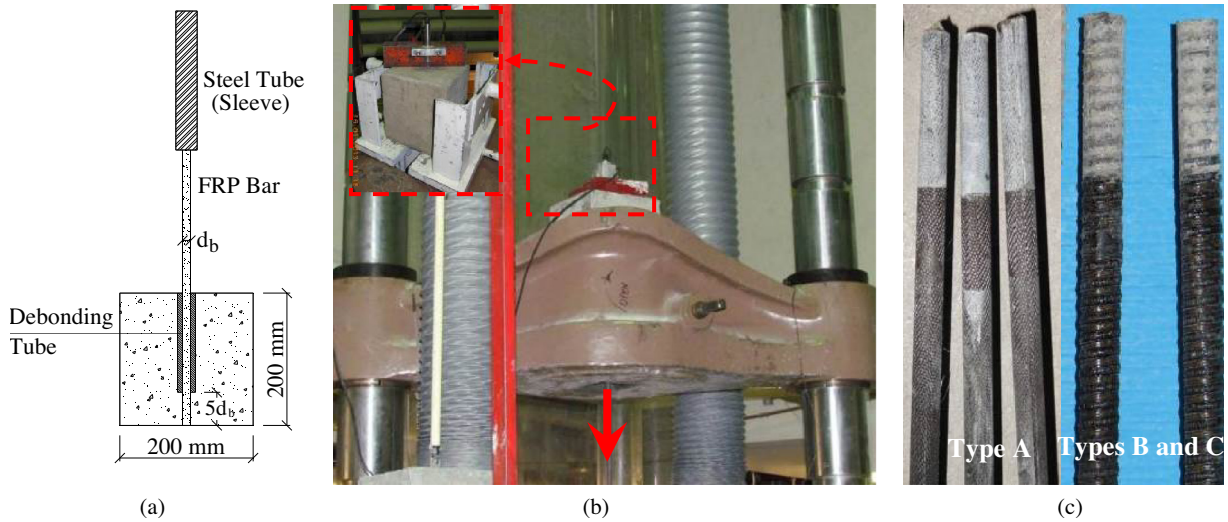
Pullout test. (a) Specimen geometry; (b) test setup; (c) typical pullout bond failure.
